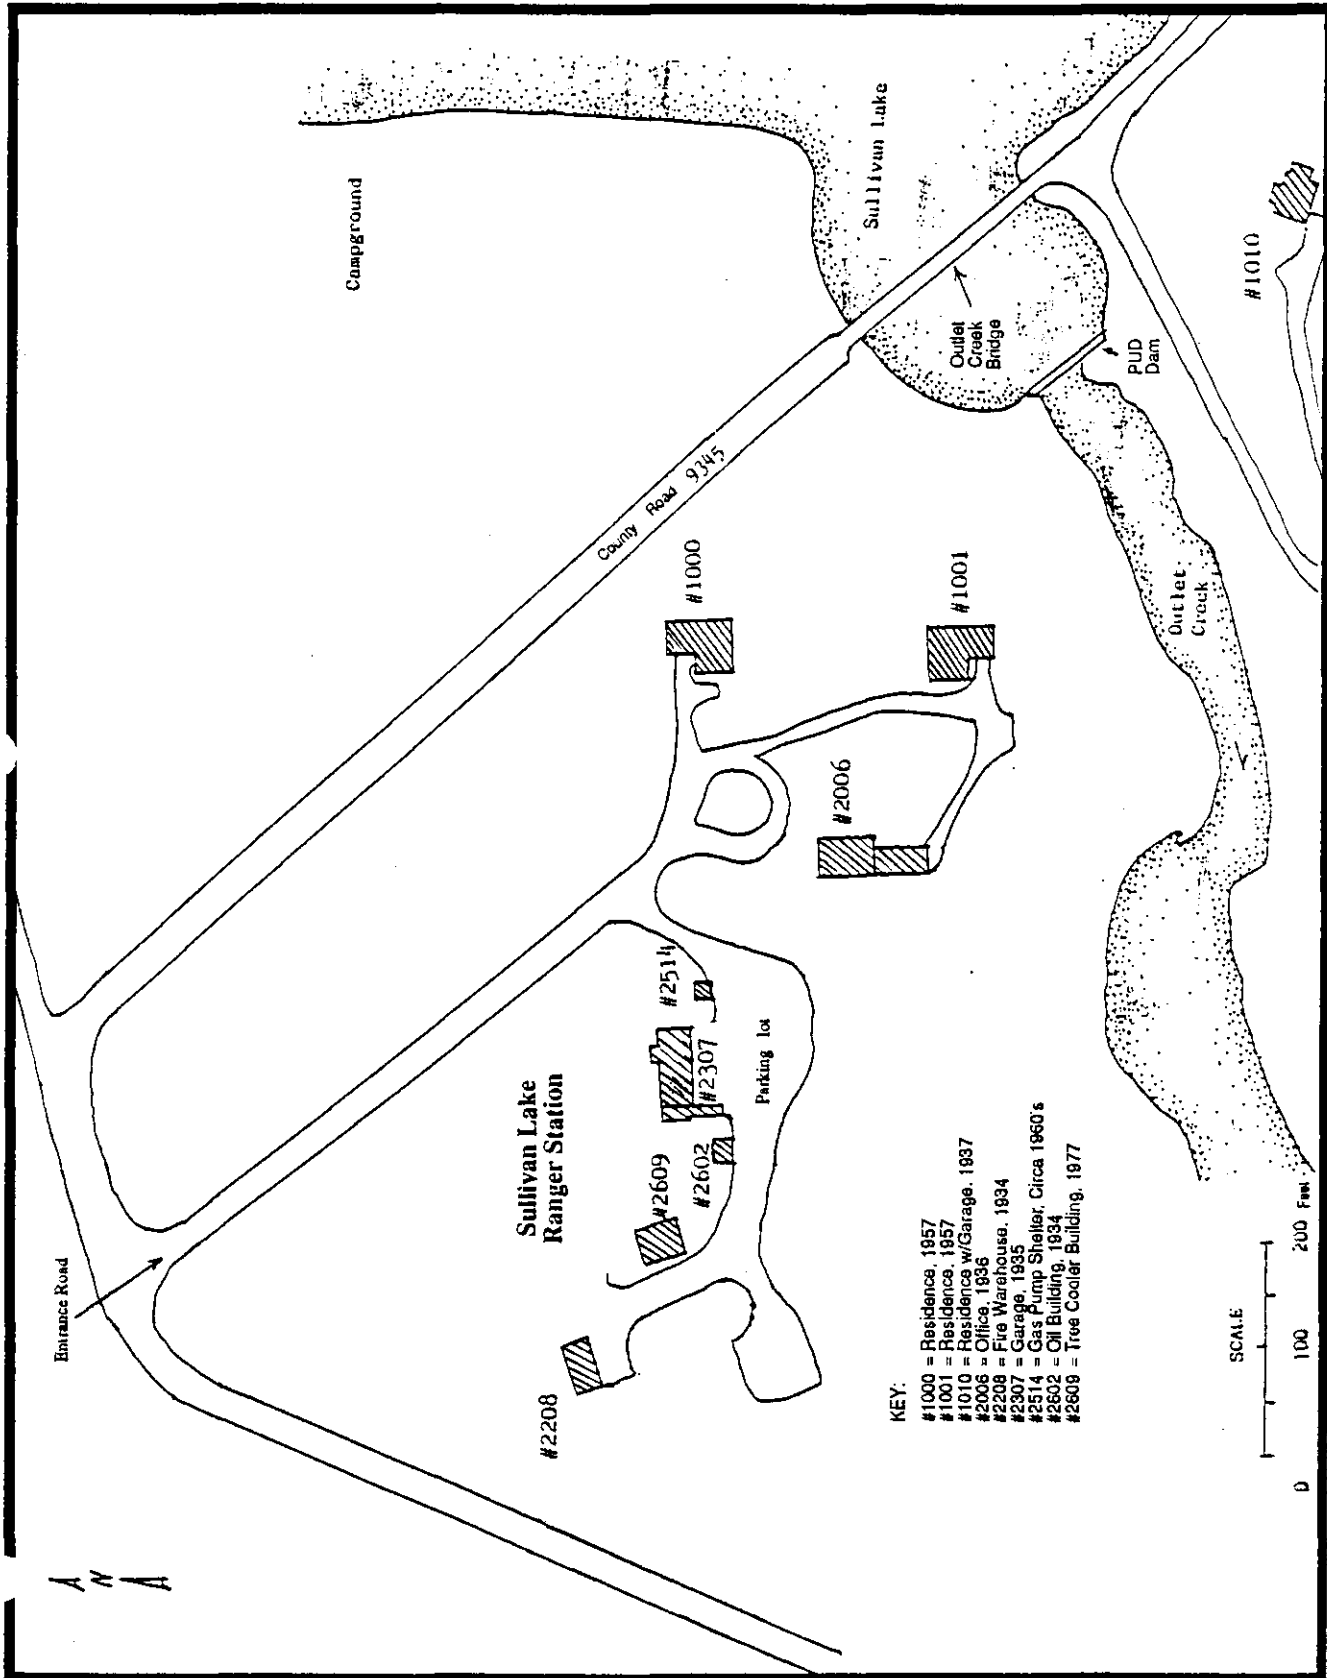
Sullivan Lake Ranger Station and Outlet Creek Bridge.
